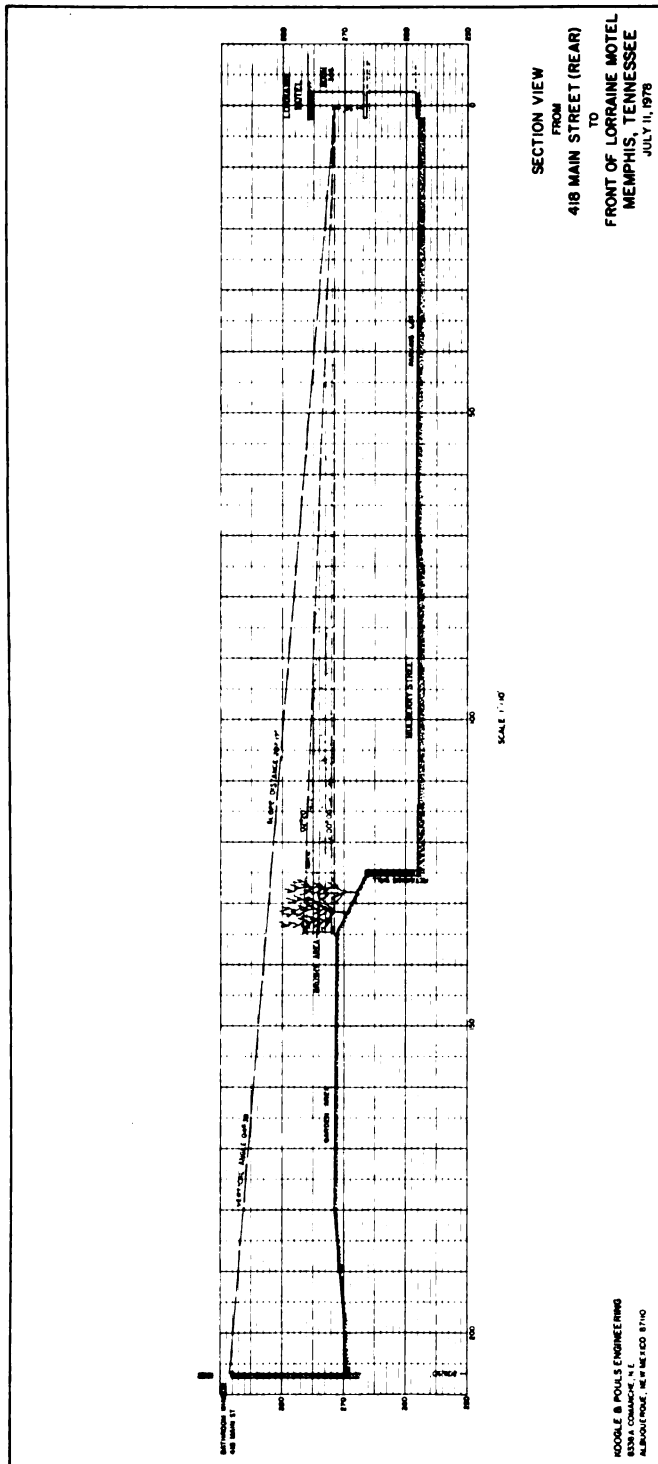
Section view from 418 Main Street (rear) to front of Lorraine Motel.
